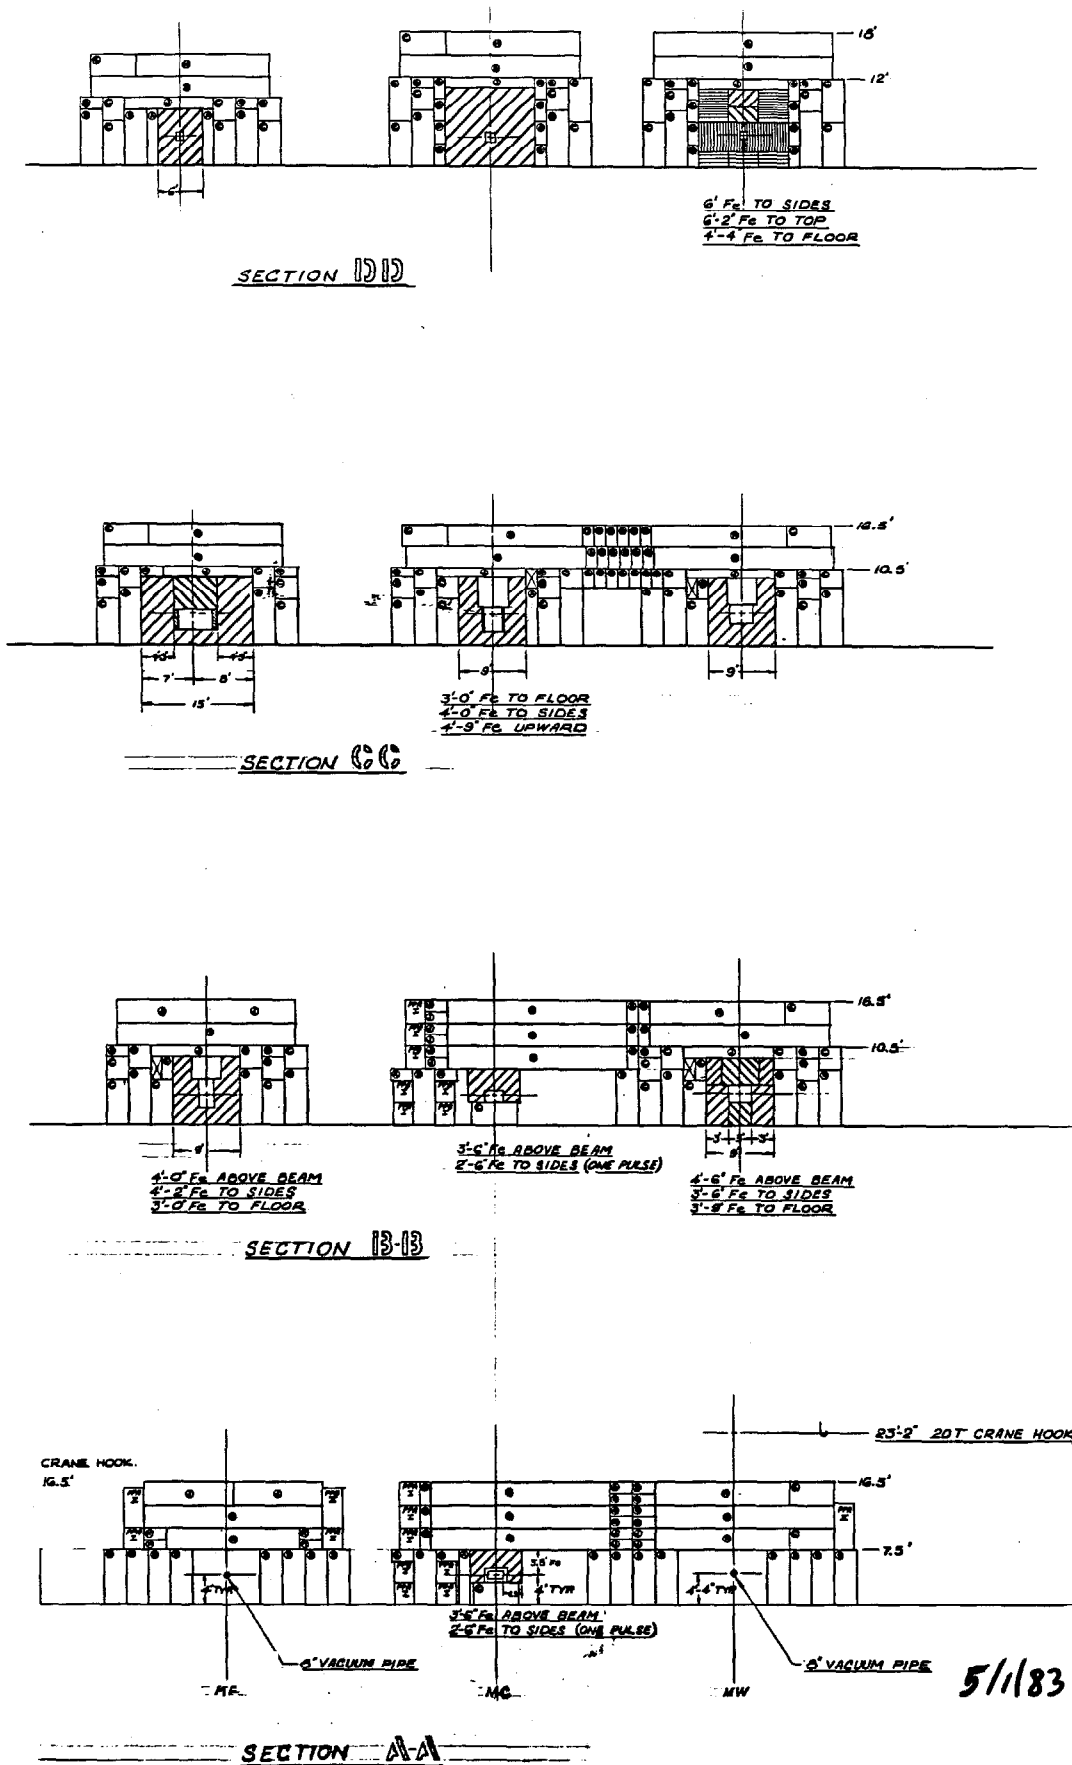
Cross Sections of Tevatron Detector Building Target Piles. Cuts look upstream at lettered locations referenced to Fig. 4.
